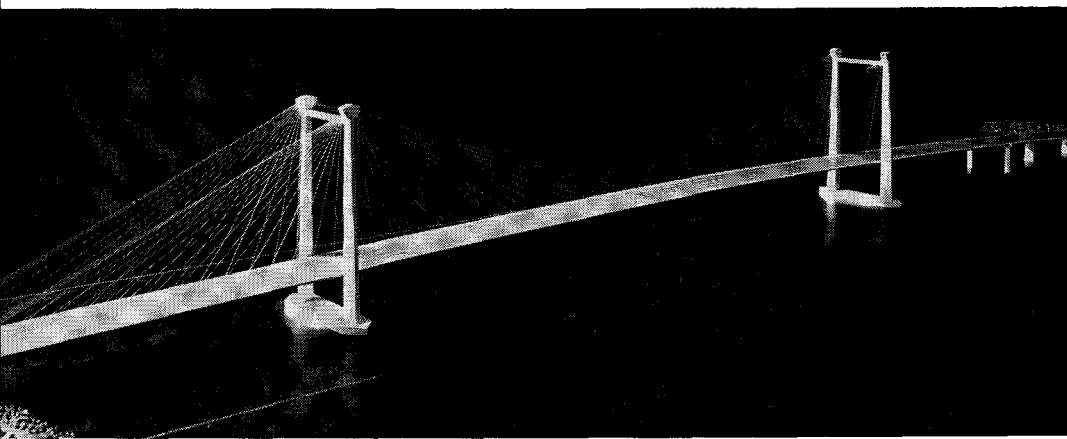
Fan-type stay cables for Columbia River Bridge, Pasco Kennewick (300 m span).
